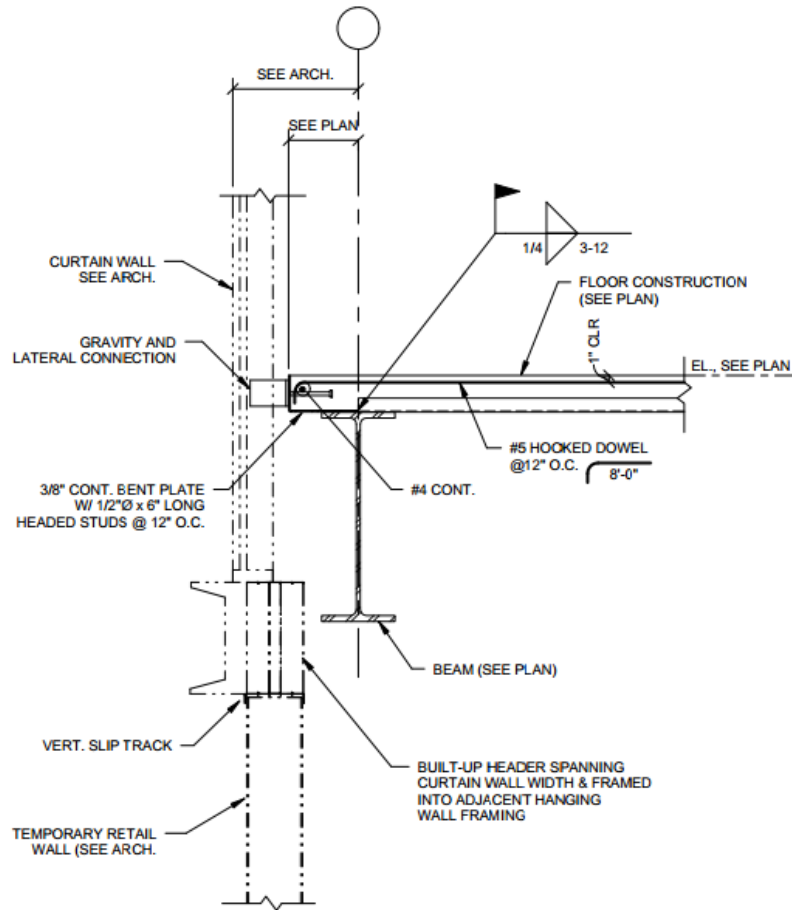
TYPICAL FLOOR TO CURTAIN WALL CONNECTION
